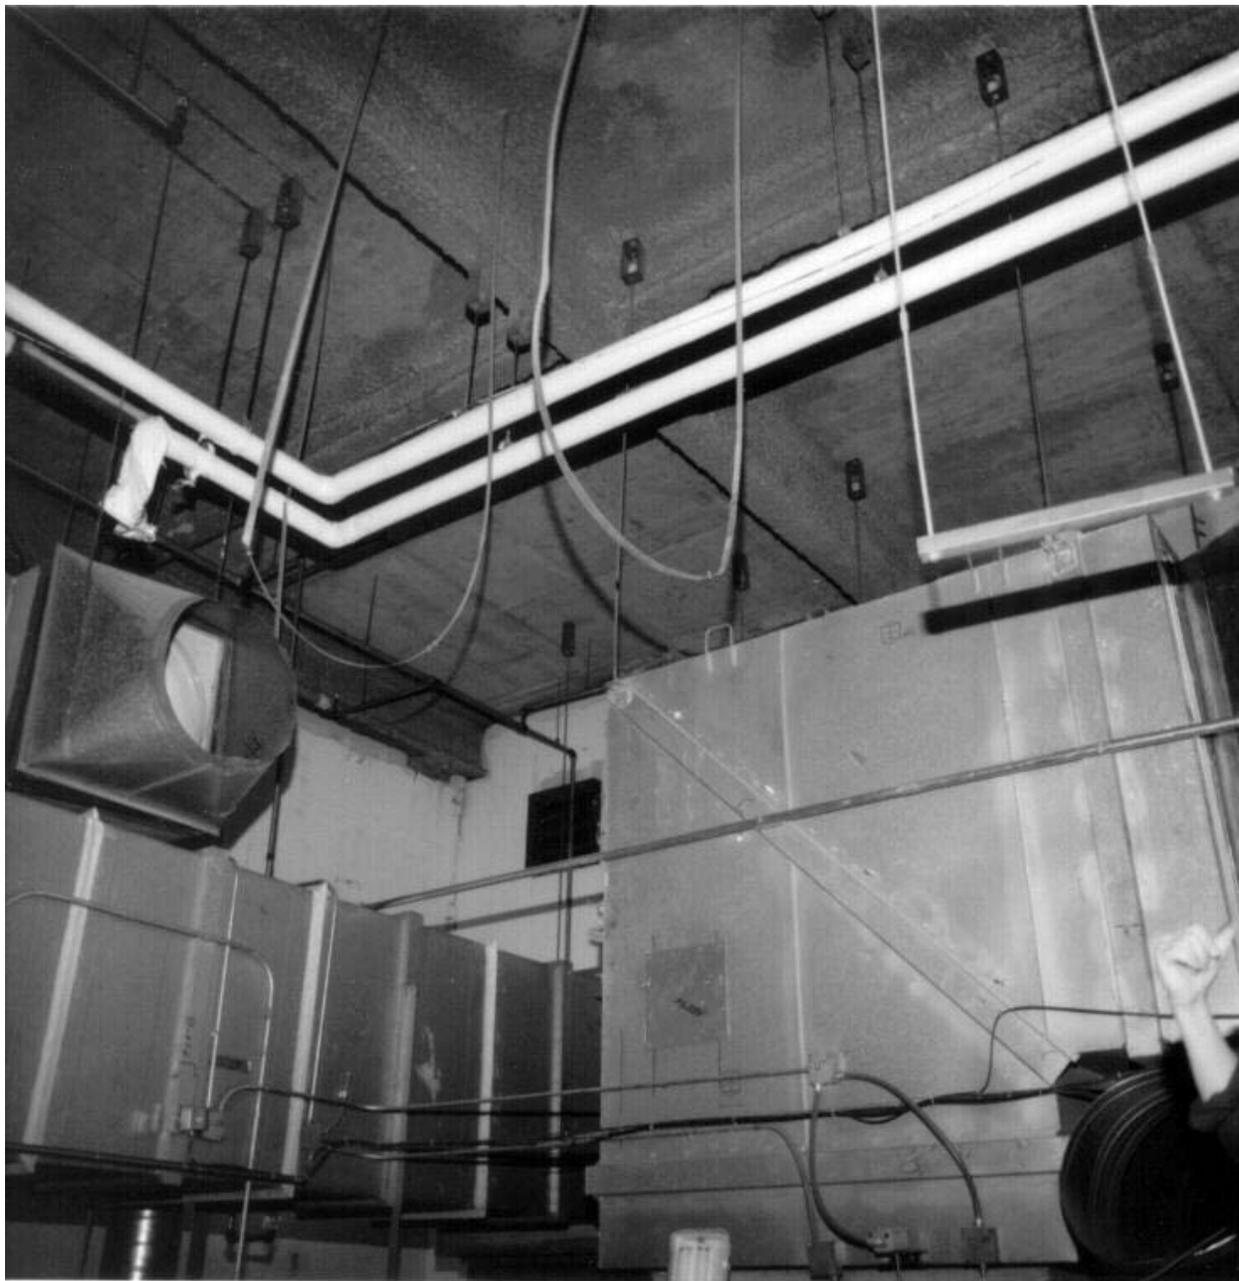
Collapsed unbraced ducts and hangers dangling from floor above in the 1994 Northridge Earthquake (Photo courtesy of Mason Industries).
